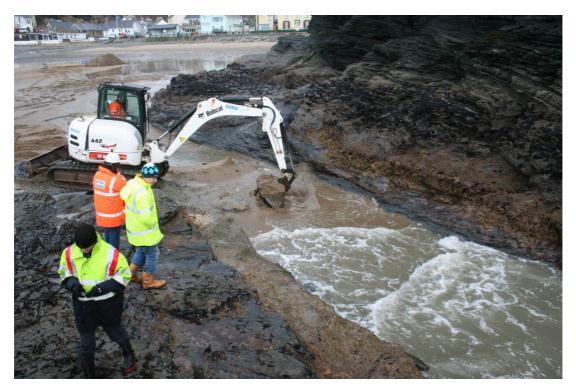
Looking south at trial-pit A. The sewer pipe lies beneath survey staff.
